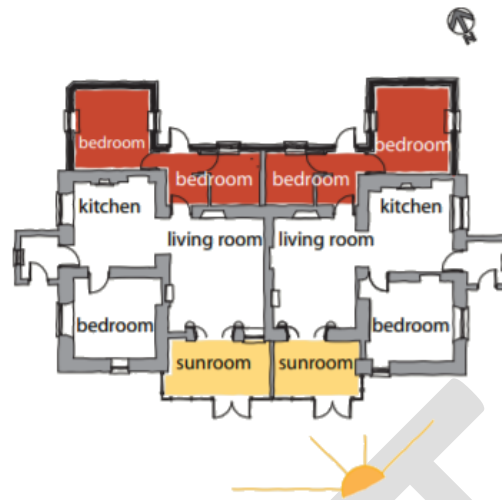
The floor plan of a pair of rural cottages shows, in red, a newly constructed, well-insulated, north facing extension housing bathrooms and bedrooms and, in yellow, south-facing sunrooms to take advantage of solar gain and provide heat and light to the living rooms behind.
